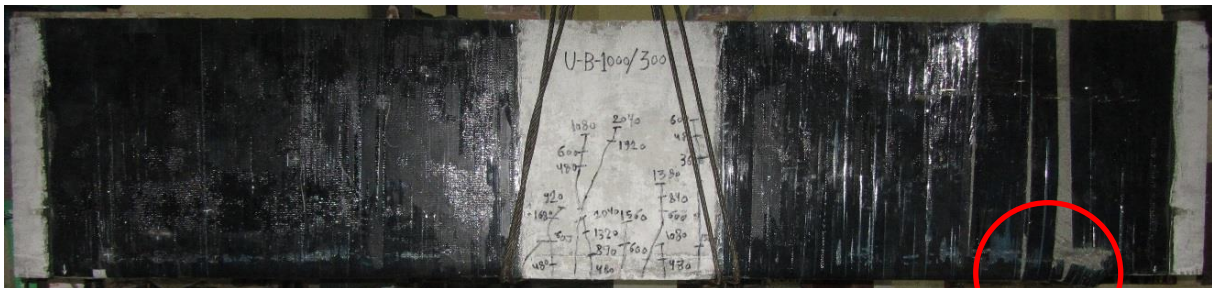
Strengthened beam crack pattern (U-B-1000/300)
